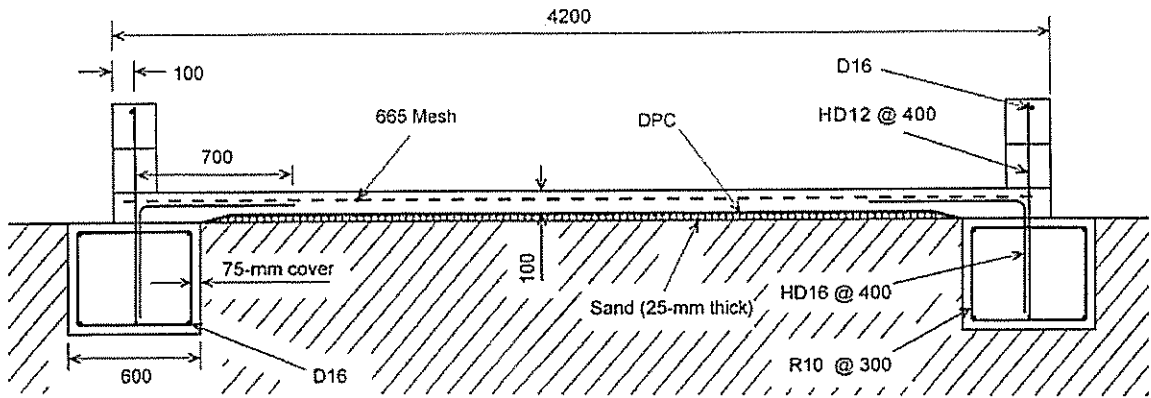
Section Showing Construction Details of Combination Slab and Beam Tests
